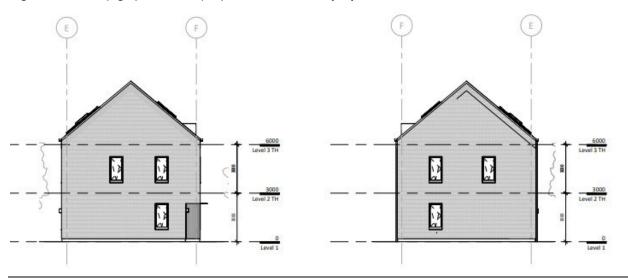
East (right) and West (left) elevations for the proposed townhouses
